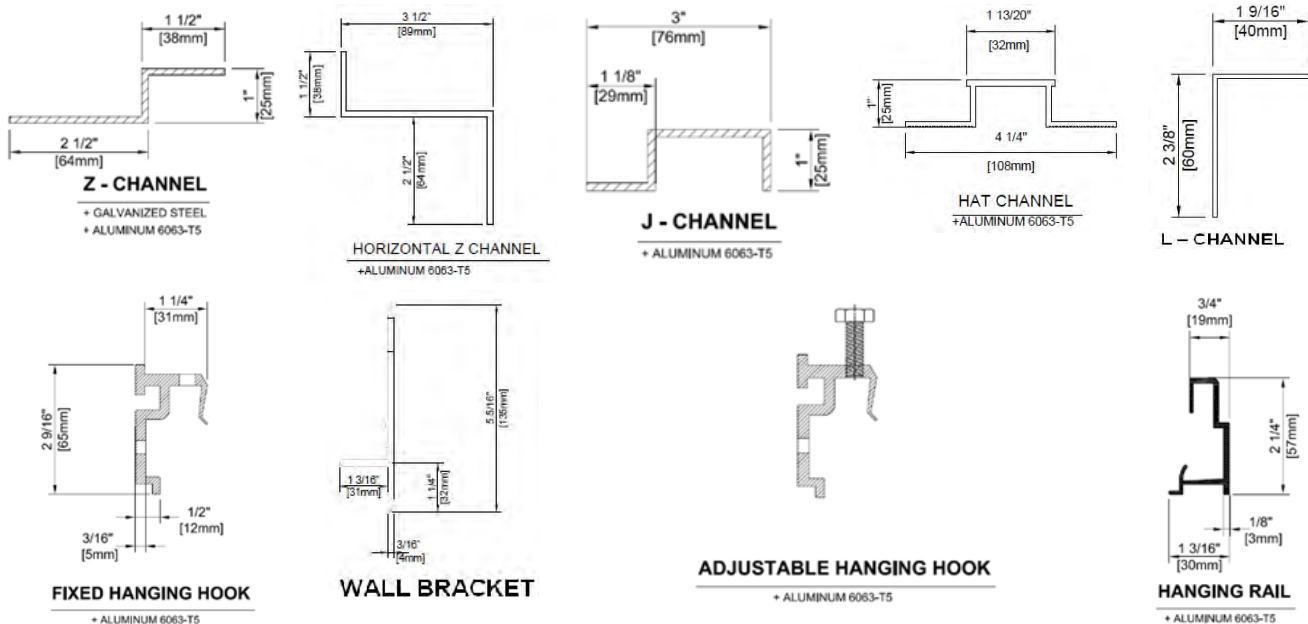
PRODEX IGN WALL PANEL CLADDING SYSTEM COMPONENTS
